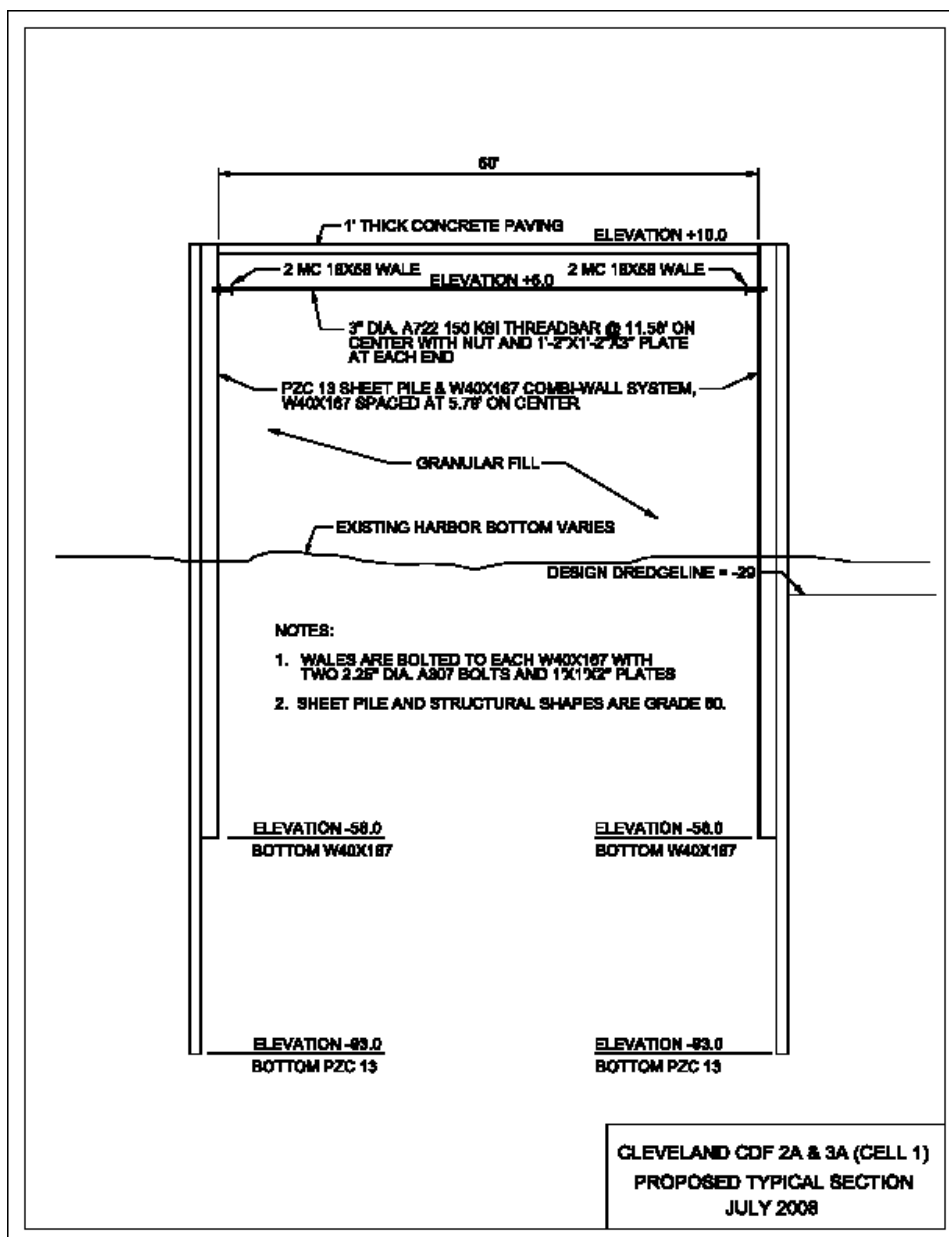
Site 3 Typical Cross Section Along Arrowhead Breakwater
